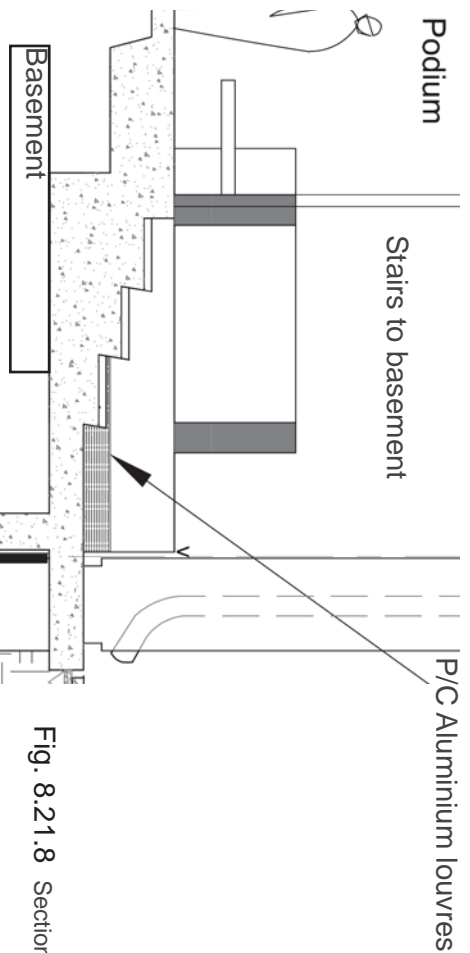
Section detail of louvres for cross-ventilation
